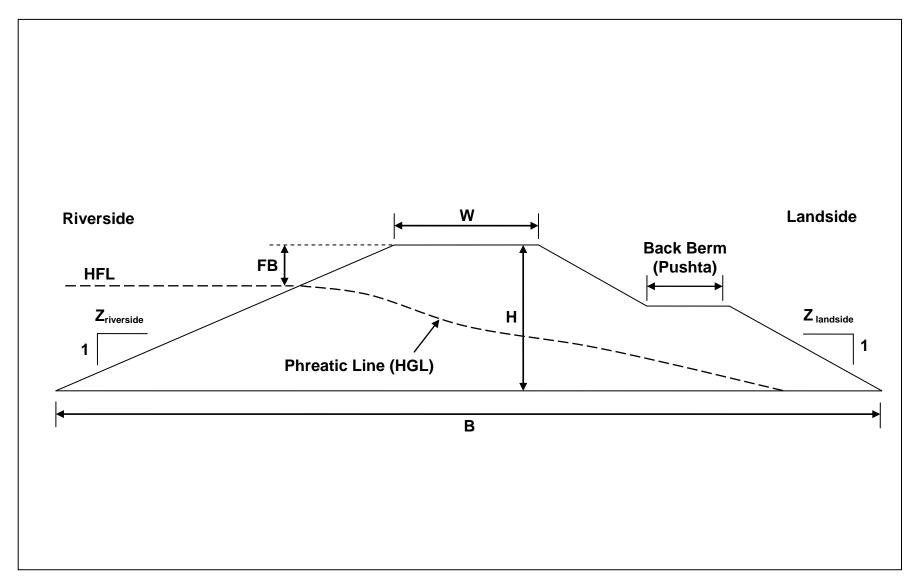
Sketch of a Typical Flood Bund with Back Berm (Pushta)
